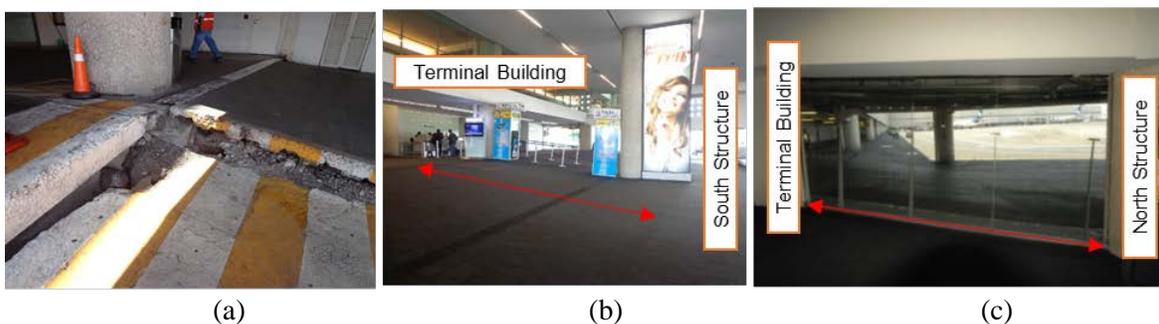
Current conditions of Terminal 2: (a) Terminal Building-South Structure connection at the ground-floor level; (b) Access aisle at the ground-floor level, South Structure; (c) Terminal Building-North Structure connection at the ground-floor level.
